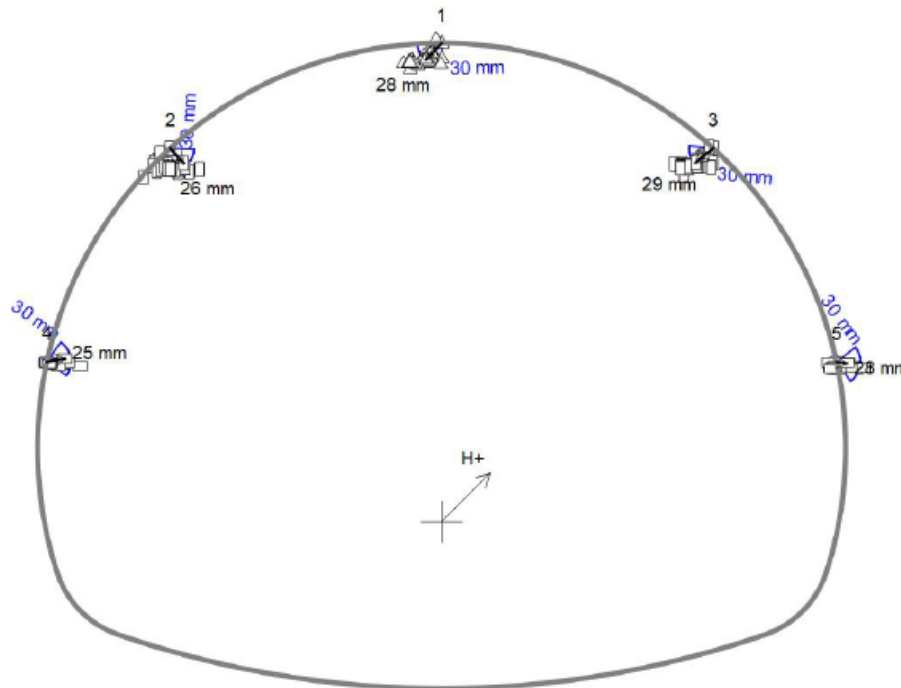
(a): Right tube Tunnel Cross section KP 26,562.000/ First measure: 21.11.2017, Last measure: 26.03.2018
